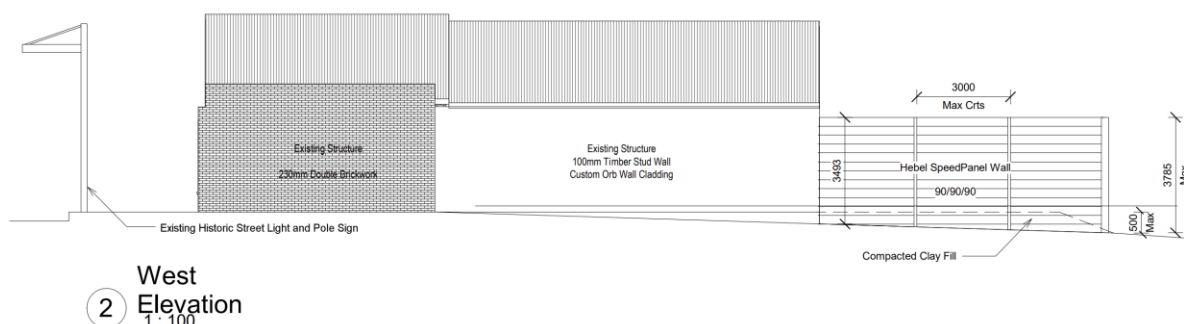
Western Elevation, Site Plan, Source: Mitech Building Designs
